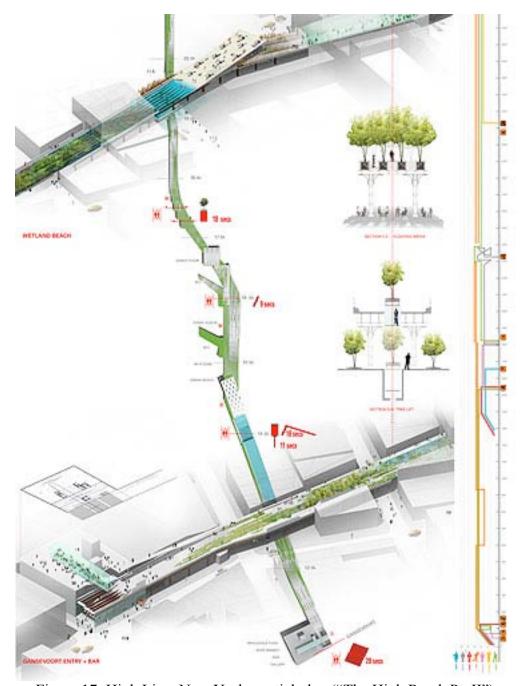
High Line, New York, partial plan ("The High Road, Pt. II")
